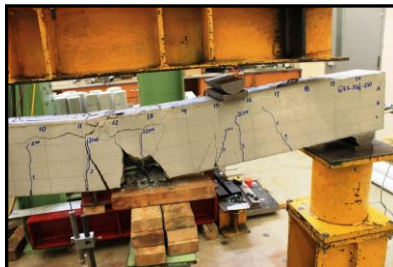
Splitting bond failure: Beam SG12.7-1.5-450
